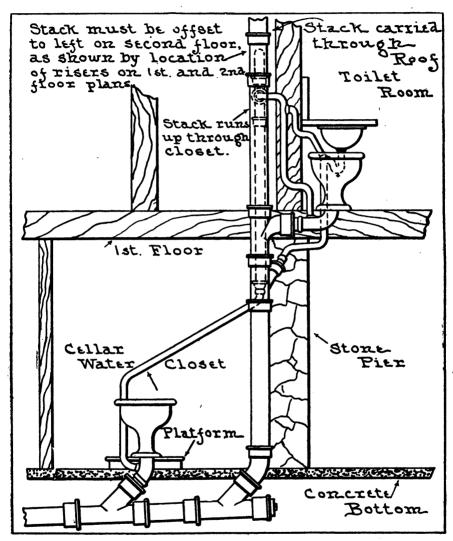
Elevation of Toilet Room Fixtures and Cellar Water Closet.
